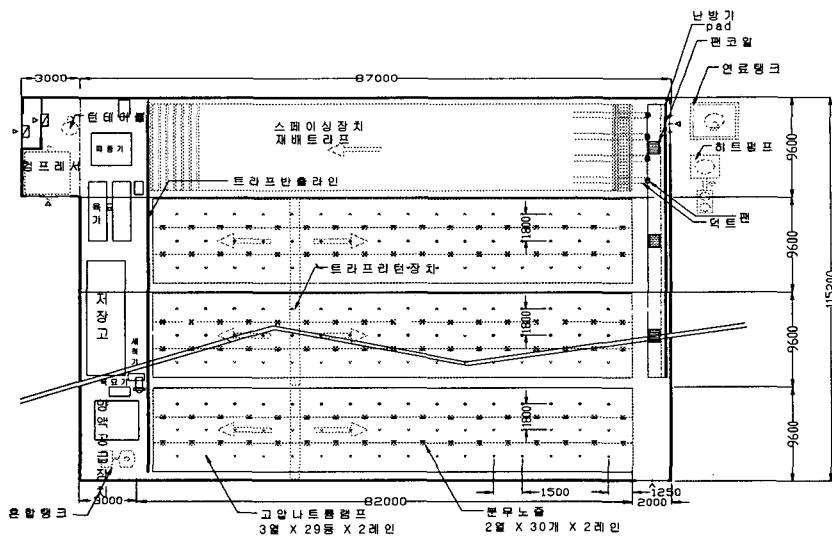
Layout of a cultivation equipment for plant factory per 10,000m<sup>2</sup>.
